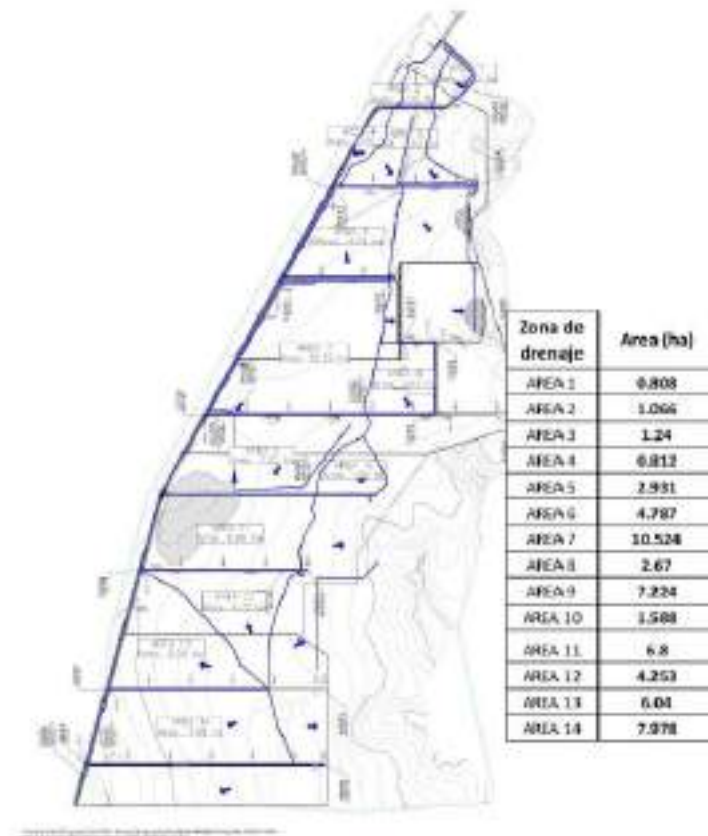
Drainage System Proposed for Ikako 0 project
